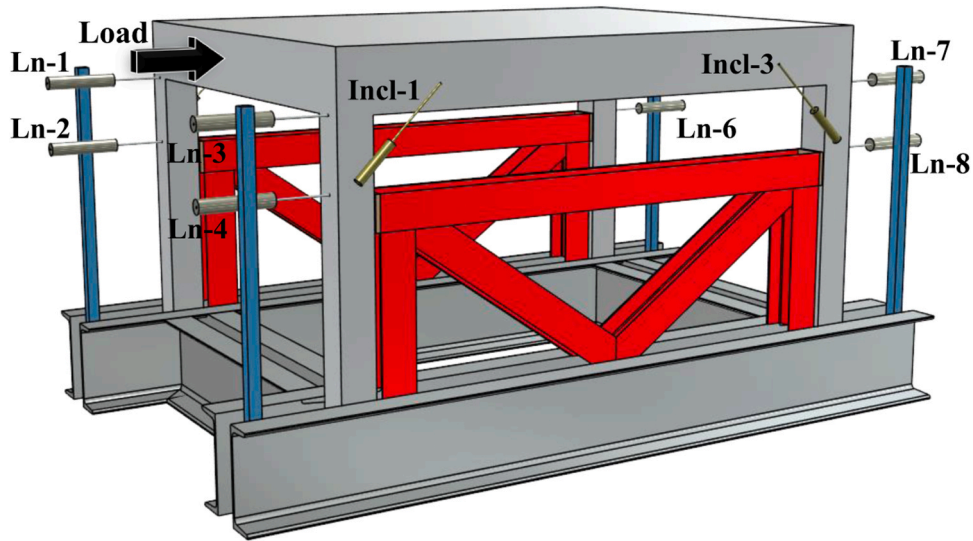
Schematic view of test setup and instrumentation of tested building.
